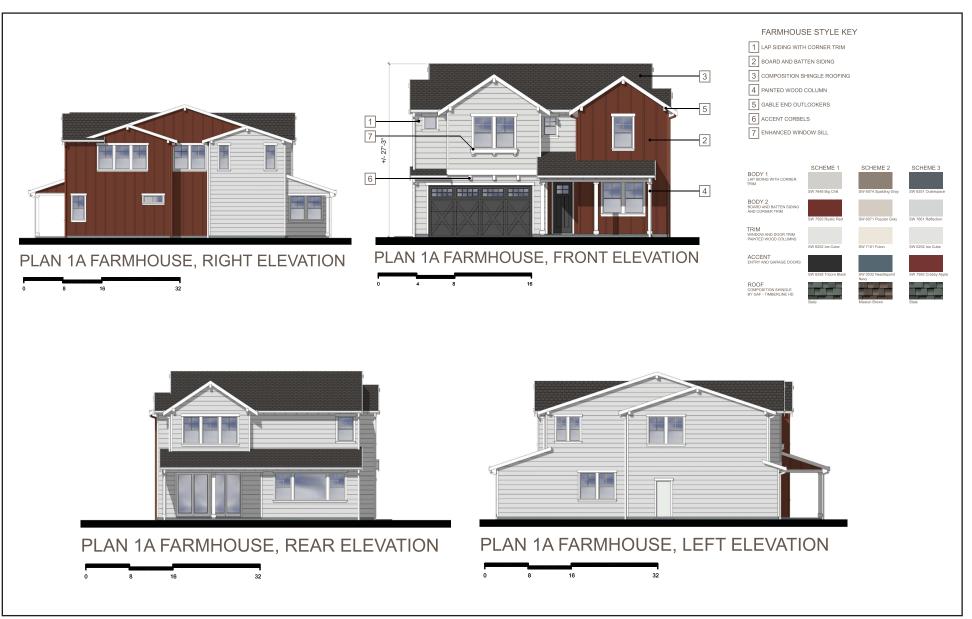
Residential Project - Farmhouse Style Conceptual Elevation
